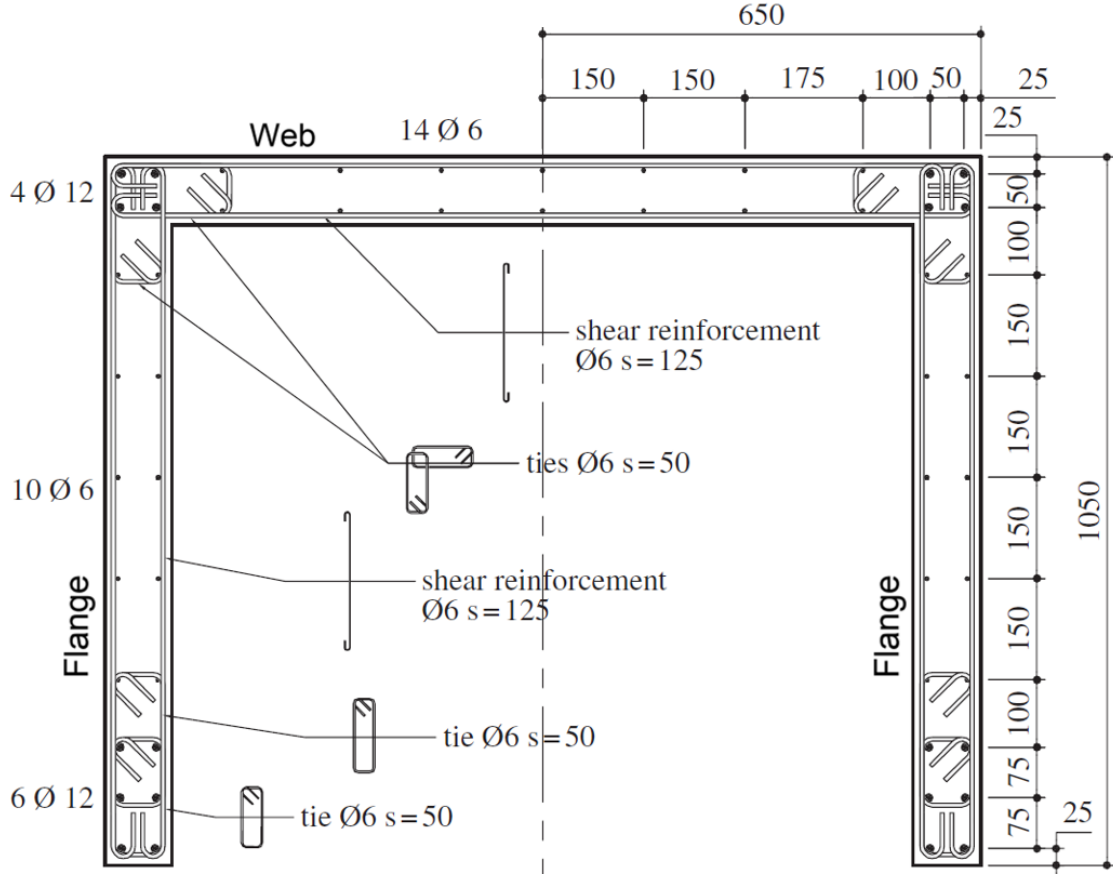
TUB: Cross section and reinforcement detailing from [3] [Unit: *mm*].
